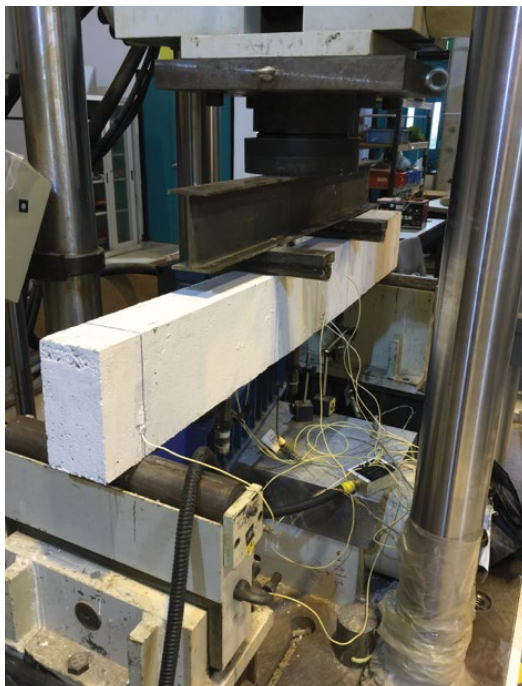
Experimental setup for reinforced concrete beam bending test
